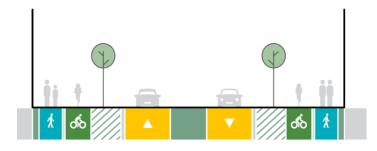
CFAF Outcome - New Connection from Dairy Flat Highway to Wilks Road indicative 24 m cross section
